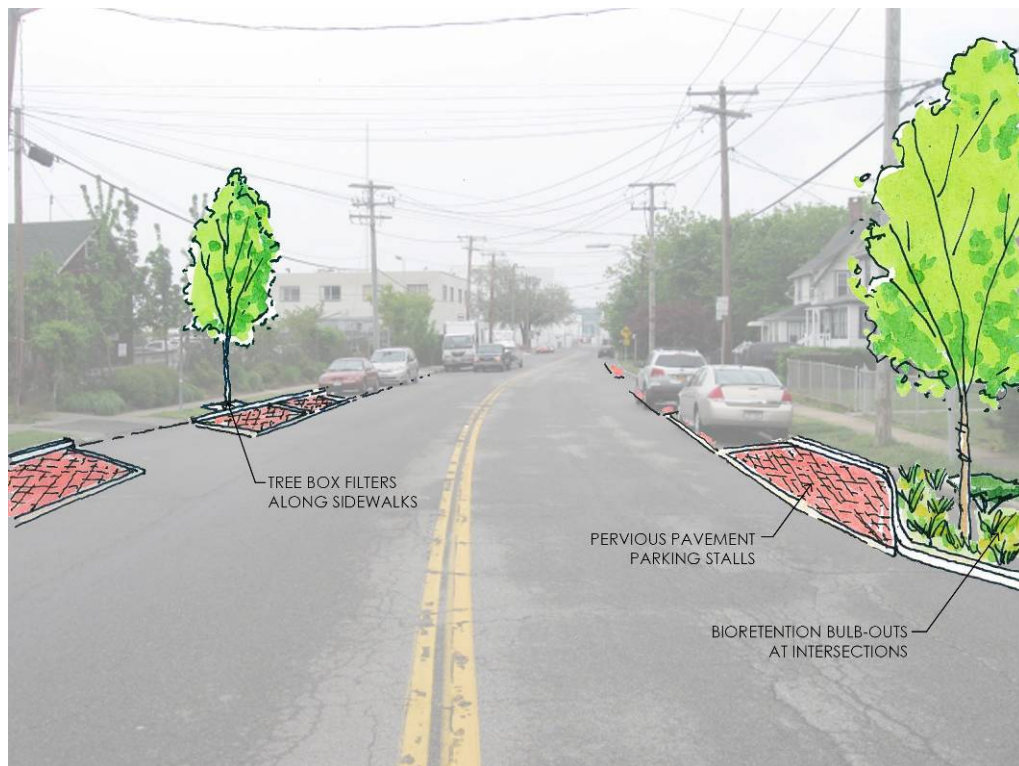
South Street Green Street Retrofit Concept Visualization
